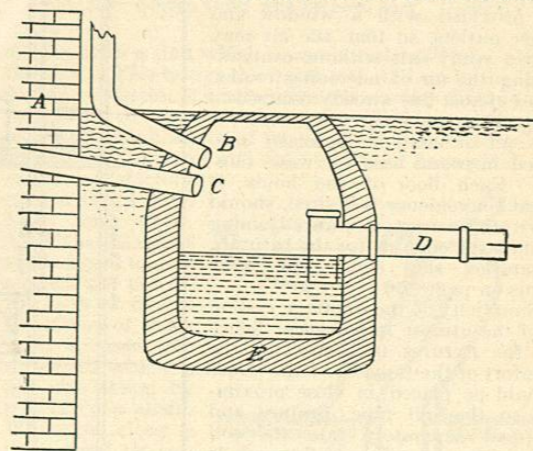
Grease Interceptor. A, House wall; B, ventilation pipe; C, inlet; D, outlet.
